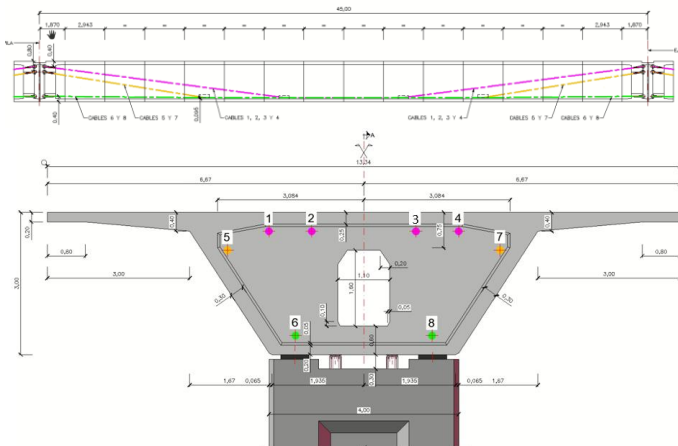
Span general elevation and cross section with the prestressing anchorages position.
